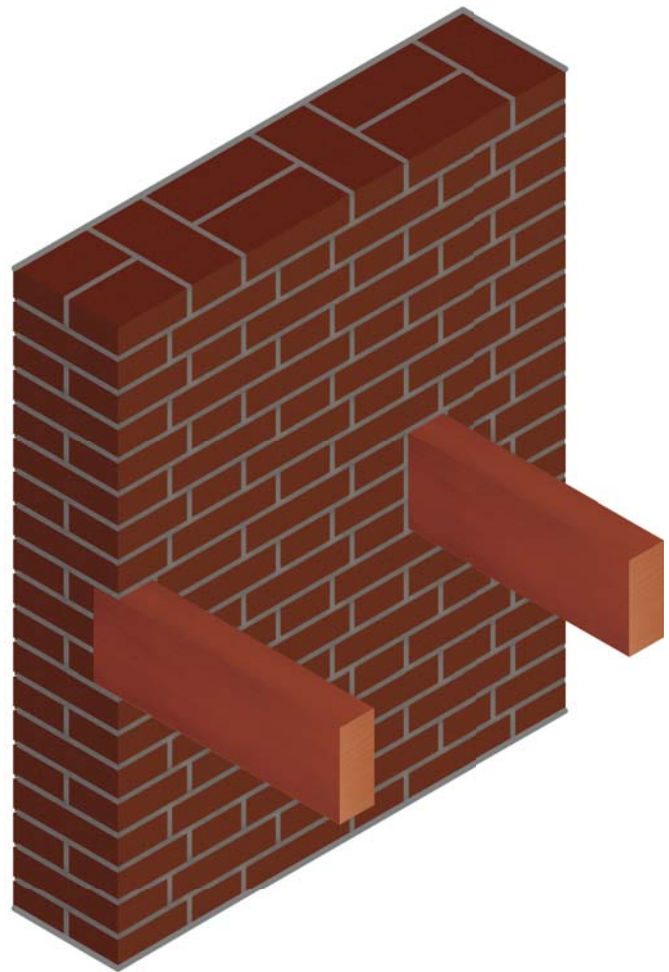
Isometric projection of a masonry wall with wooden beams supported by the wall.
